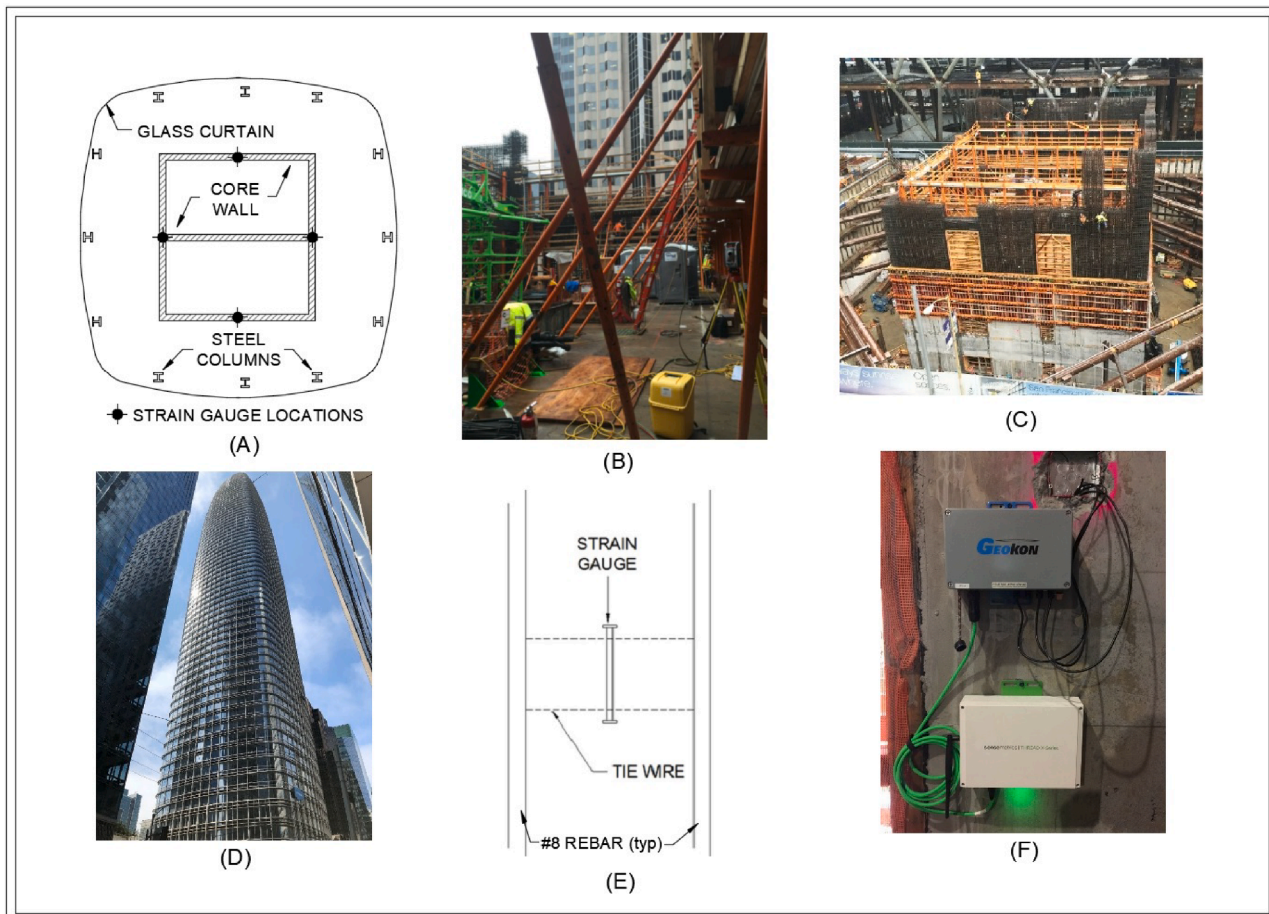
(A) Tower plan layout, (B) Inside core wall construction, (C) outside core wall construction, (D) Glass curtain wall nearing completion, (E) Illustration of gauge tied between reinforcement bars, (F) Geokon datalogger and Sensemetrics Thread.
